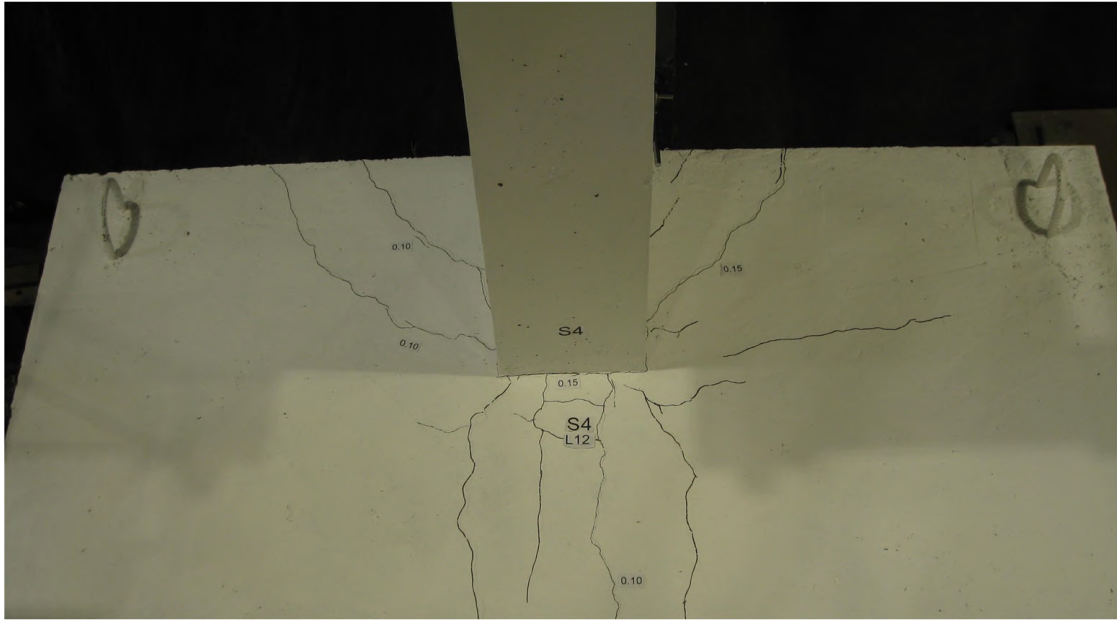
Specimen 4 slab cracks at $V = 136.0$ kN
